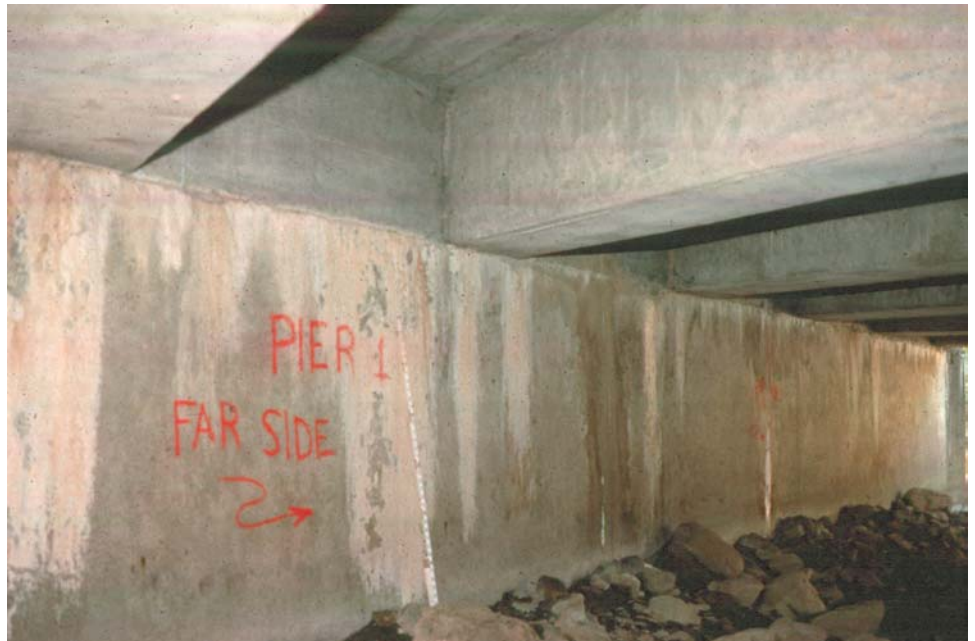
Bearing Area of Typical Cast-in-Place Concrete Tee Beam Bridge
